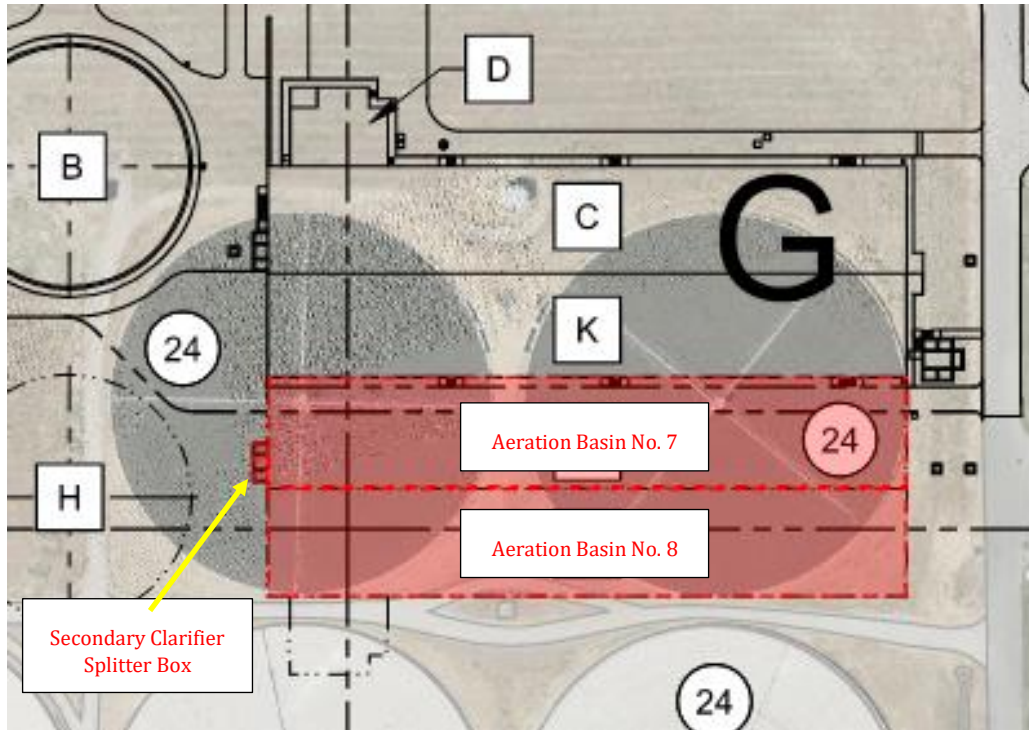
Aeration Basin Nos. 7 and 8 Site Plan
